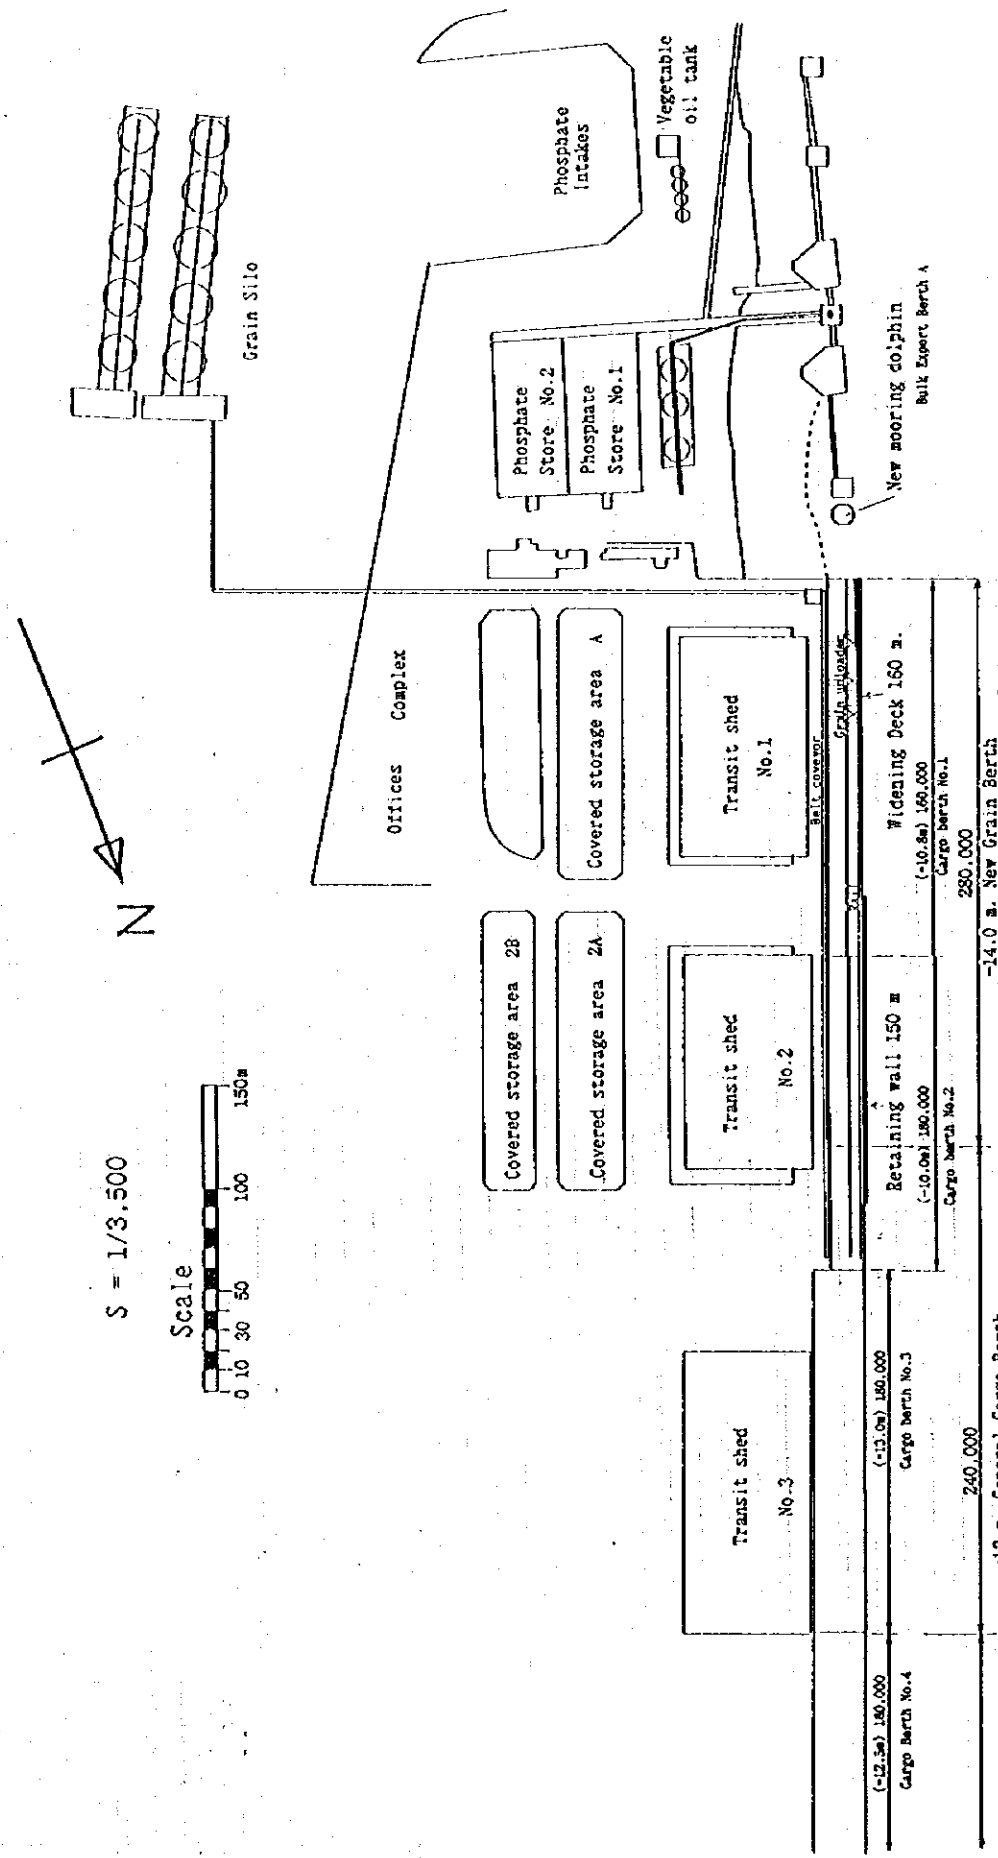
(1) Facility Layout of New Grain Berth (Alternative 1)
